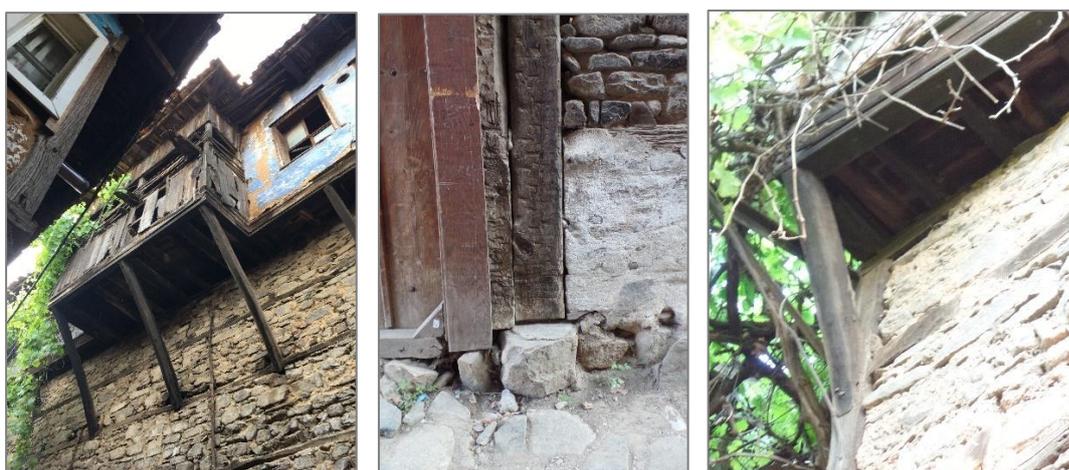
2805-1 with wide iwan projection, timber post at the edge of the stone wall
